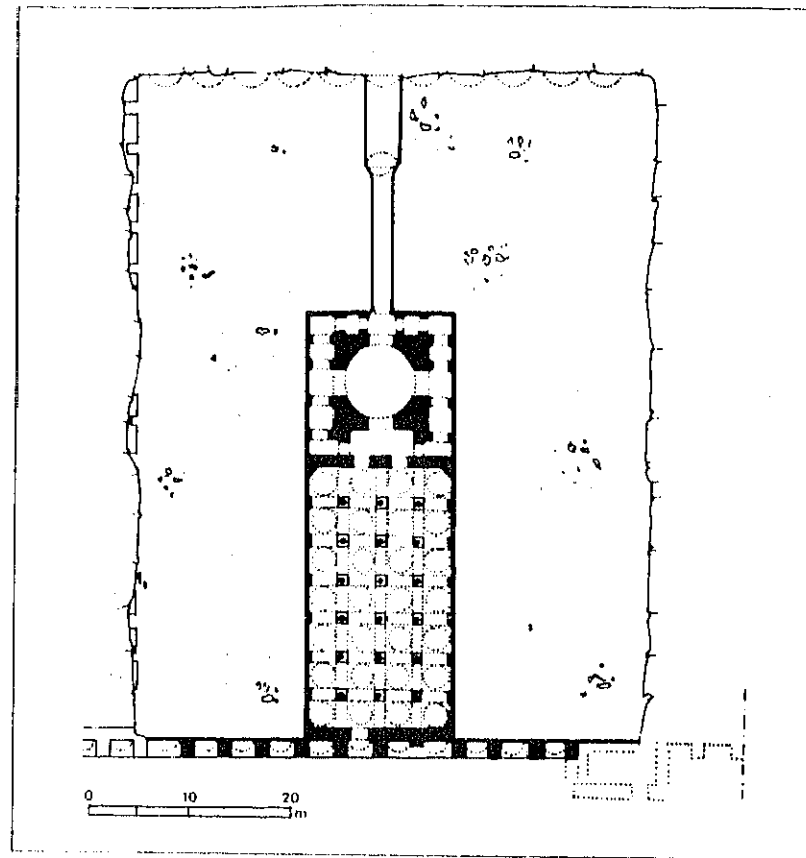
Maltepe, near Istanbul, plan of substructures of Bryas's palace (after Mango)
